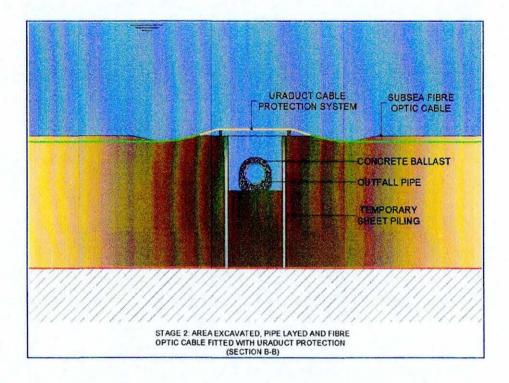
Fibre Optic Cable Crossing - Stage 2- Install Outfall Section
